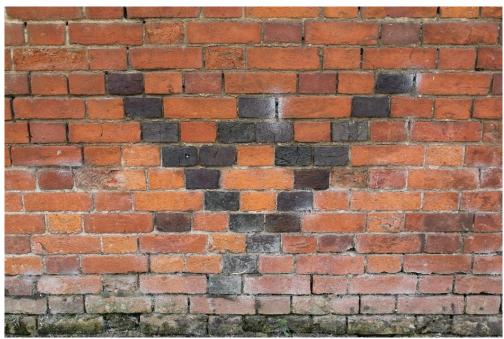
Stylised 'W' and 'Y' on 19th-century brick wall to structure 10
